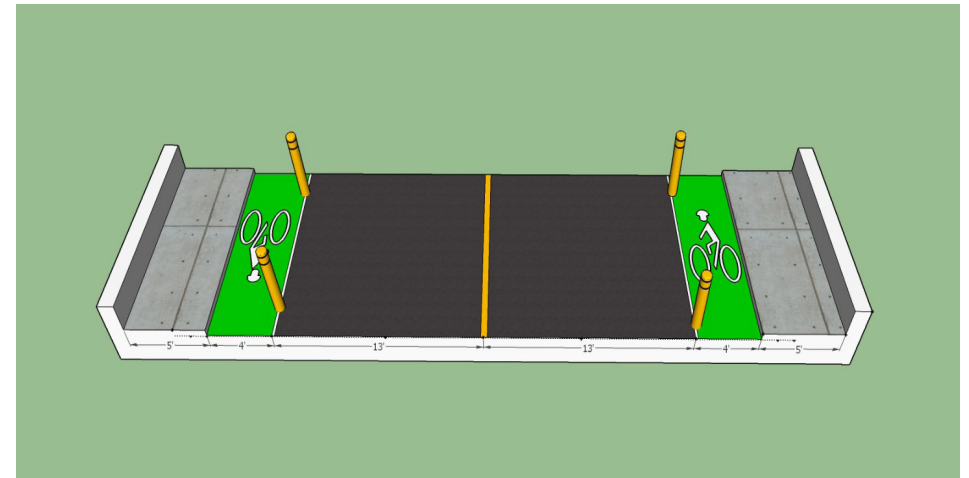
Proposed redesign for Bill Kennedy Way bridge over I-20
